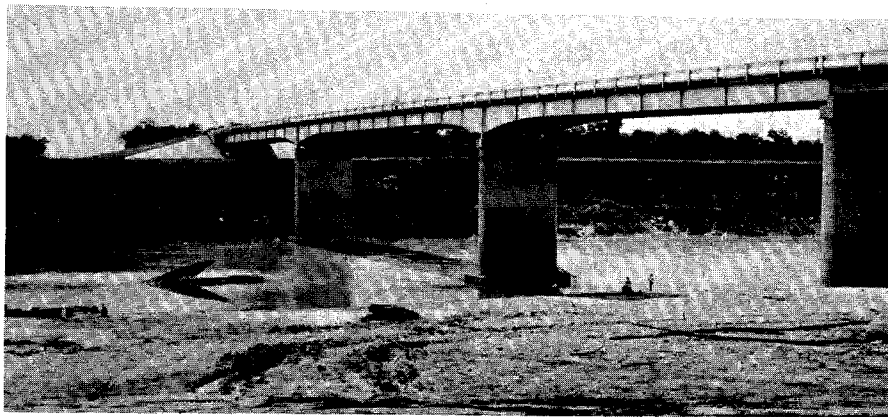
View from left bank showing erosion of right bank at bridge site in 1966. (From Texas Dept. of Highways.)
